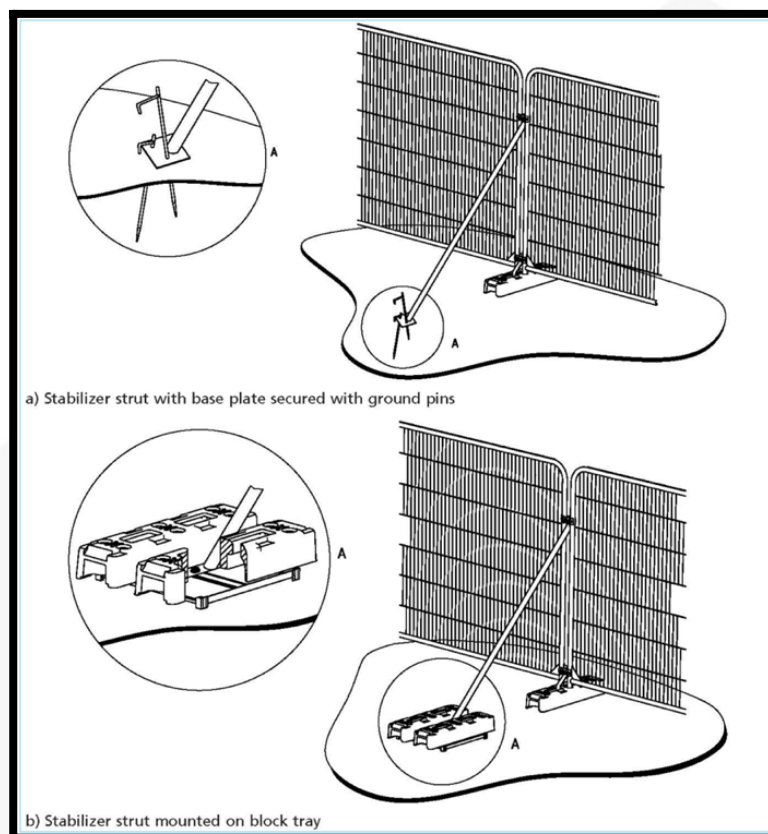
Example of protective barrier fencing with above-ground stabilising system (BS5837)
